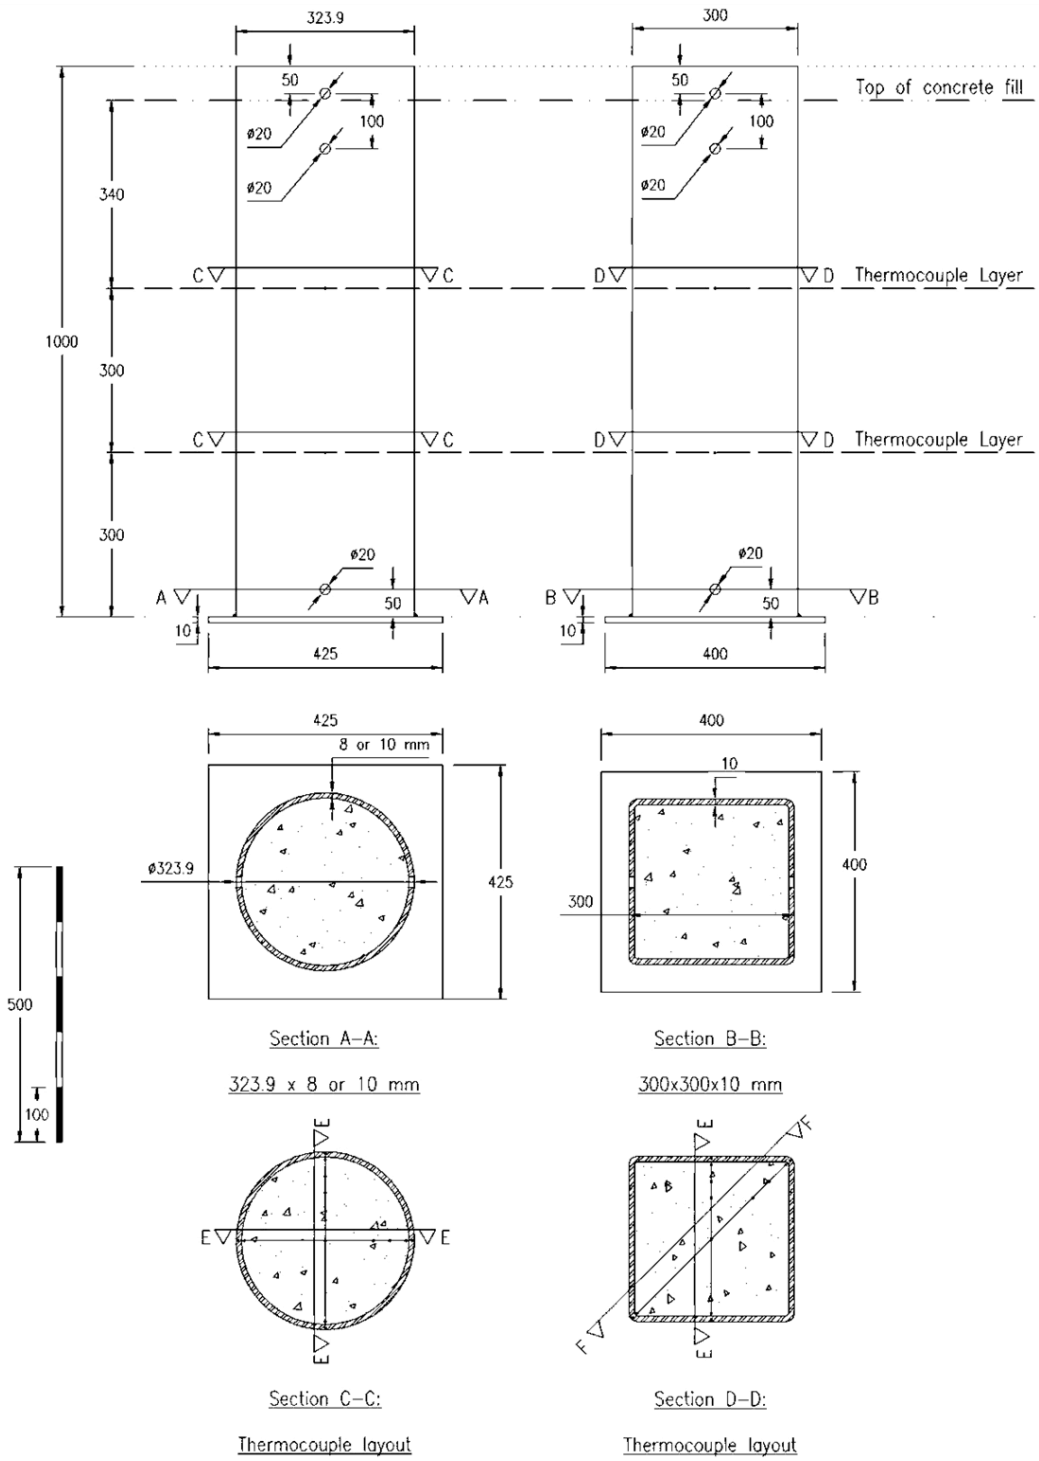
Plan, elevation and sections of S3xxxx and C3xxxx sections
